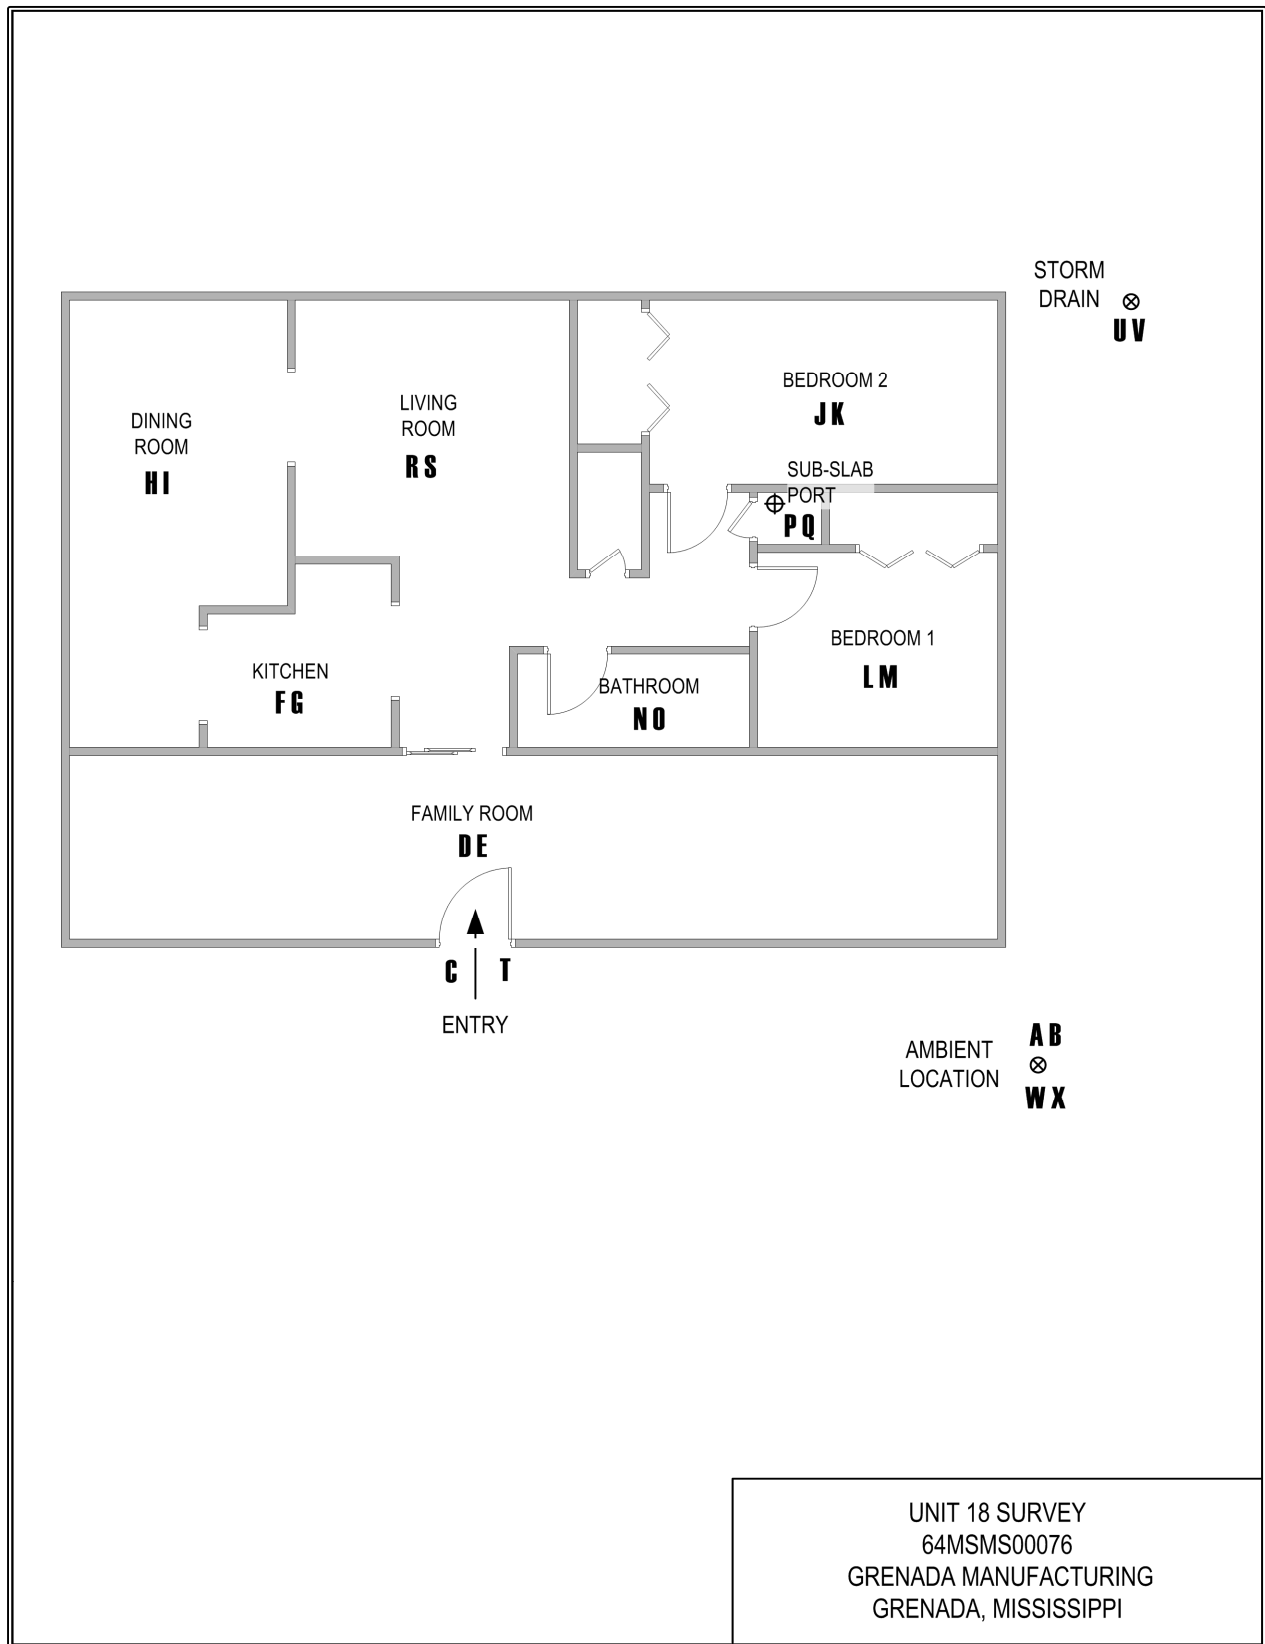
Unit 18 Survey Floor Plan, 64MSMS00076
